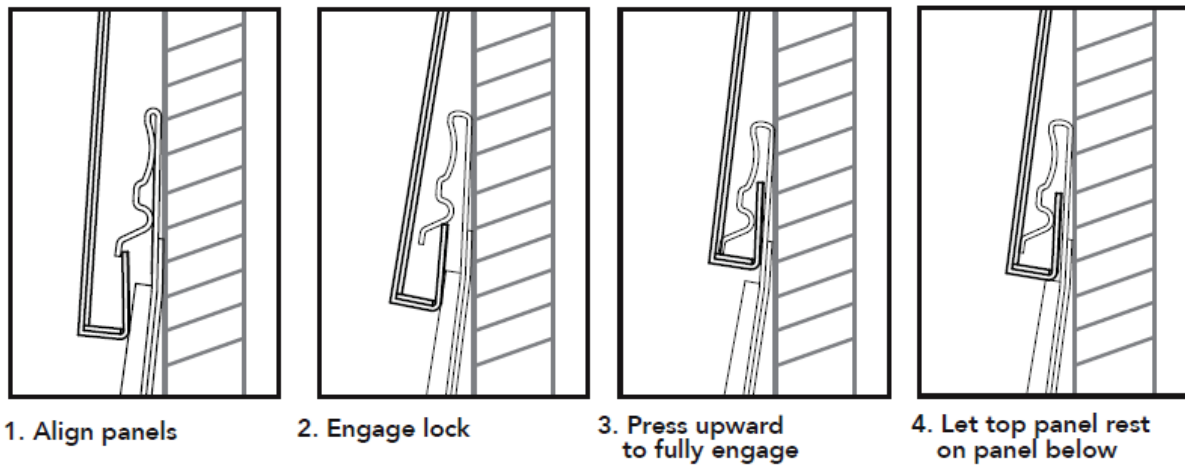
Grayne Engineered Shake and Shingle Typical Installation
